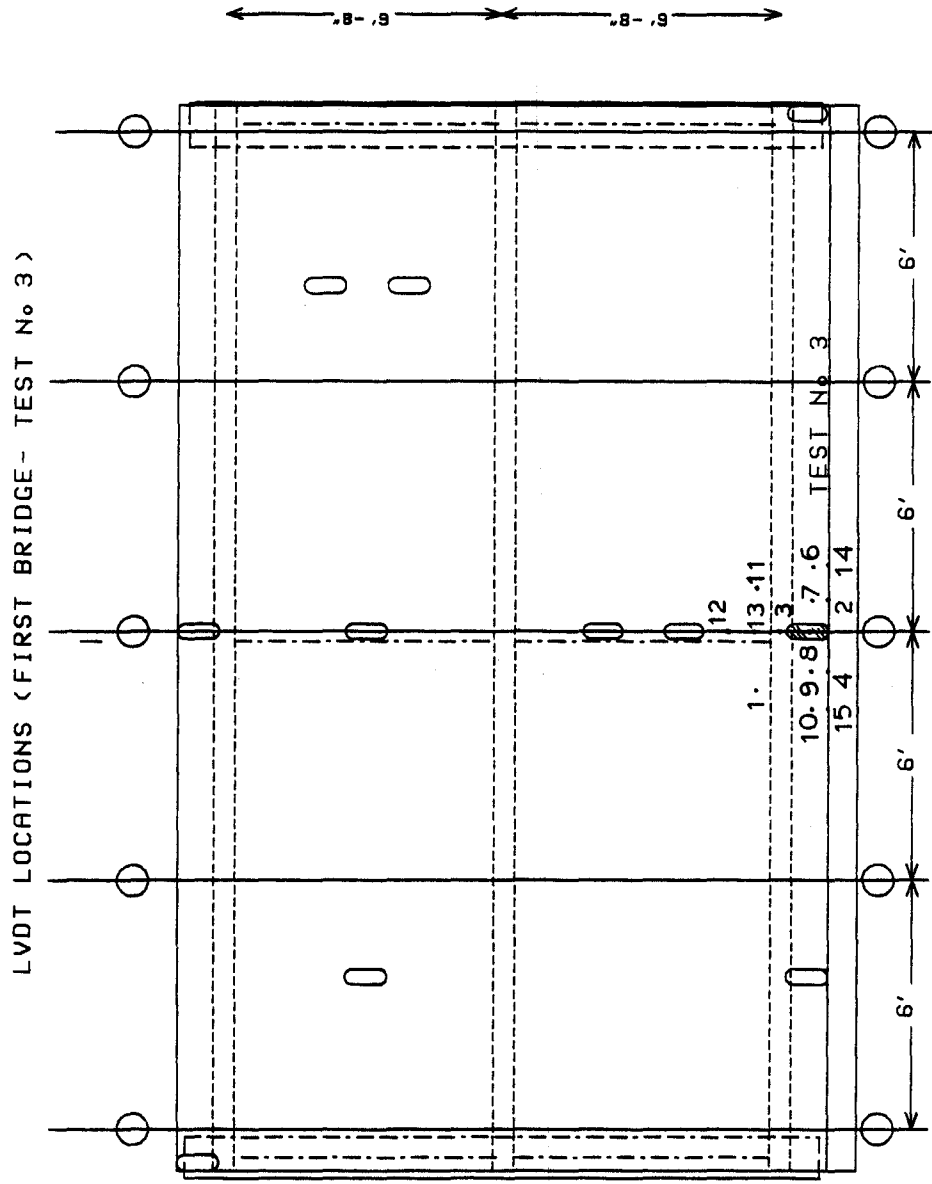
LVDT Locations (First Bridge - Test No. 3)
